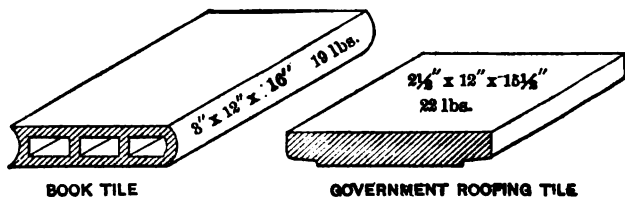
Hollow Book Tile and Solid Tile for Roofs
